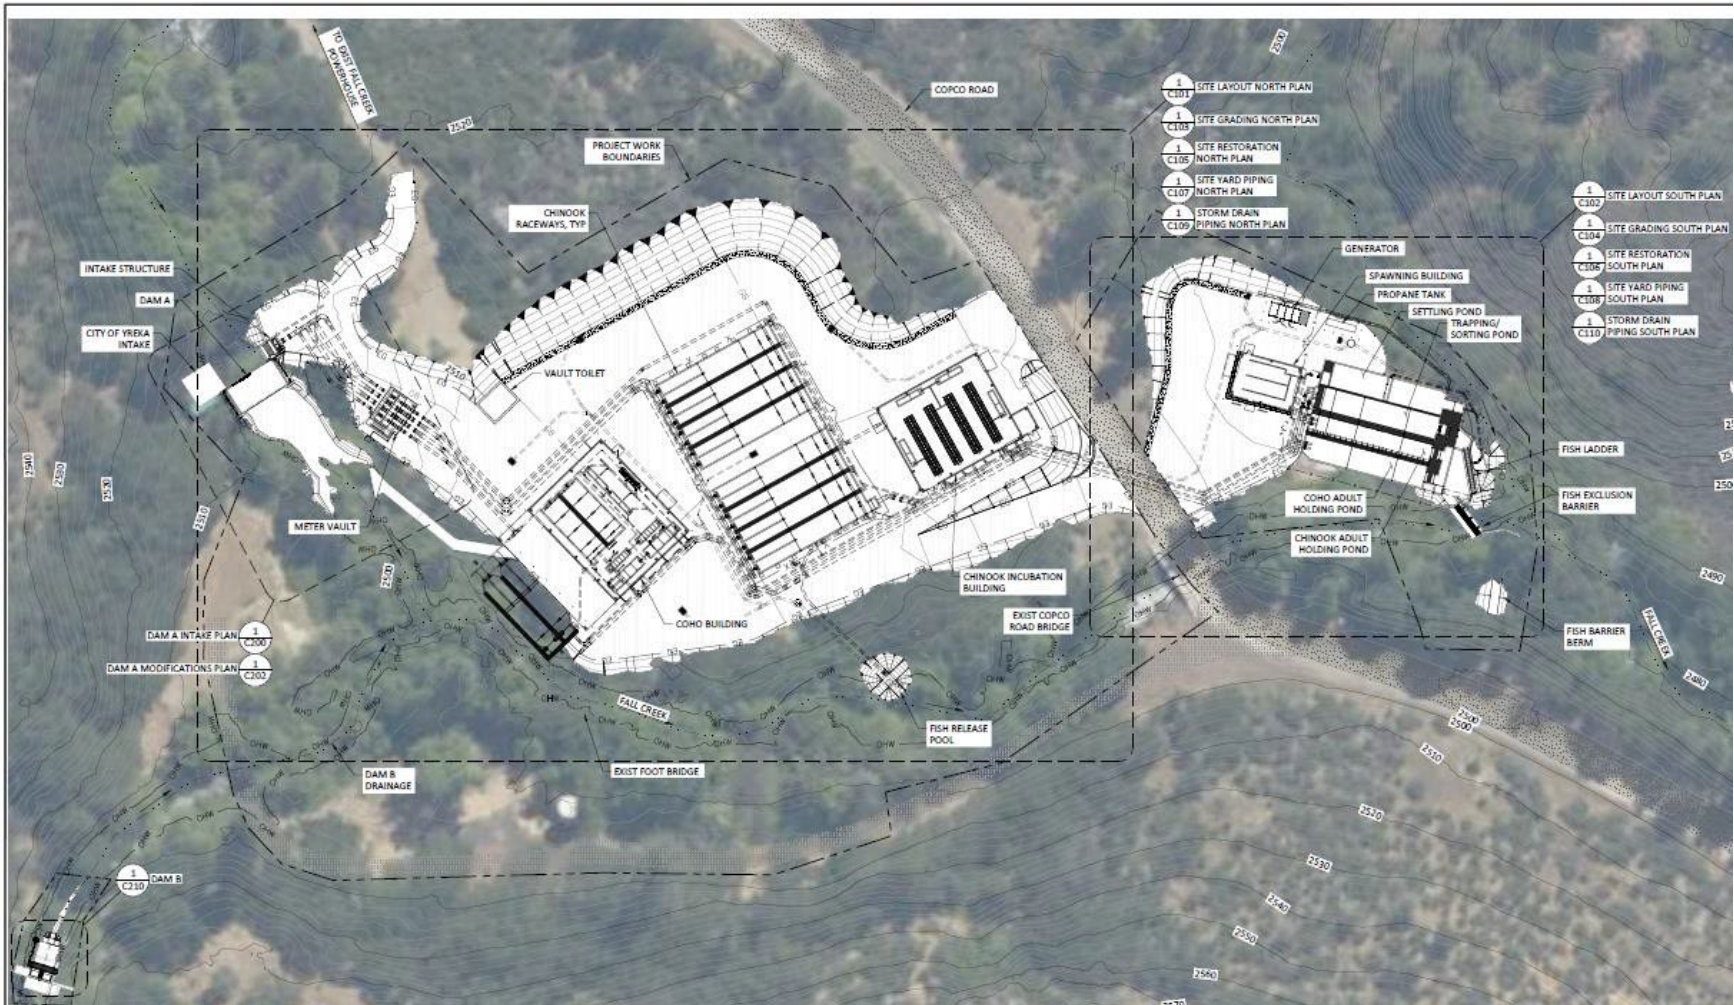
FCH Site Plan (KRRRC and McMillen Jacobs Assoc. 2020).
